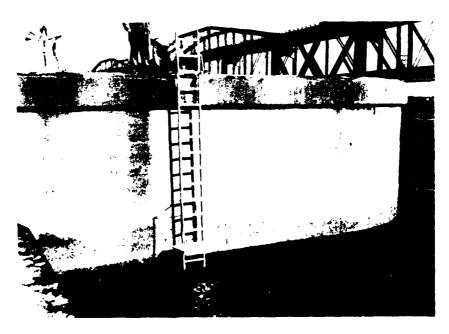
Portable aluminum ladders with platforms provided access to sides of piers
